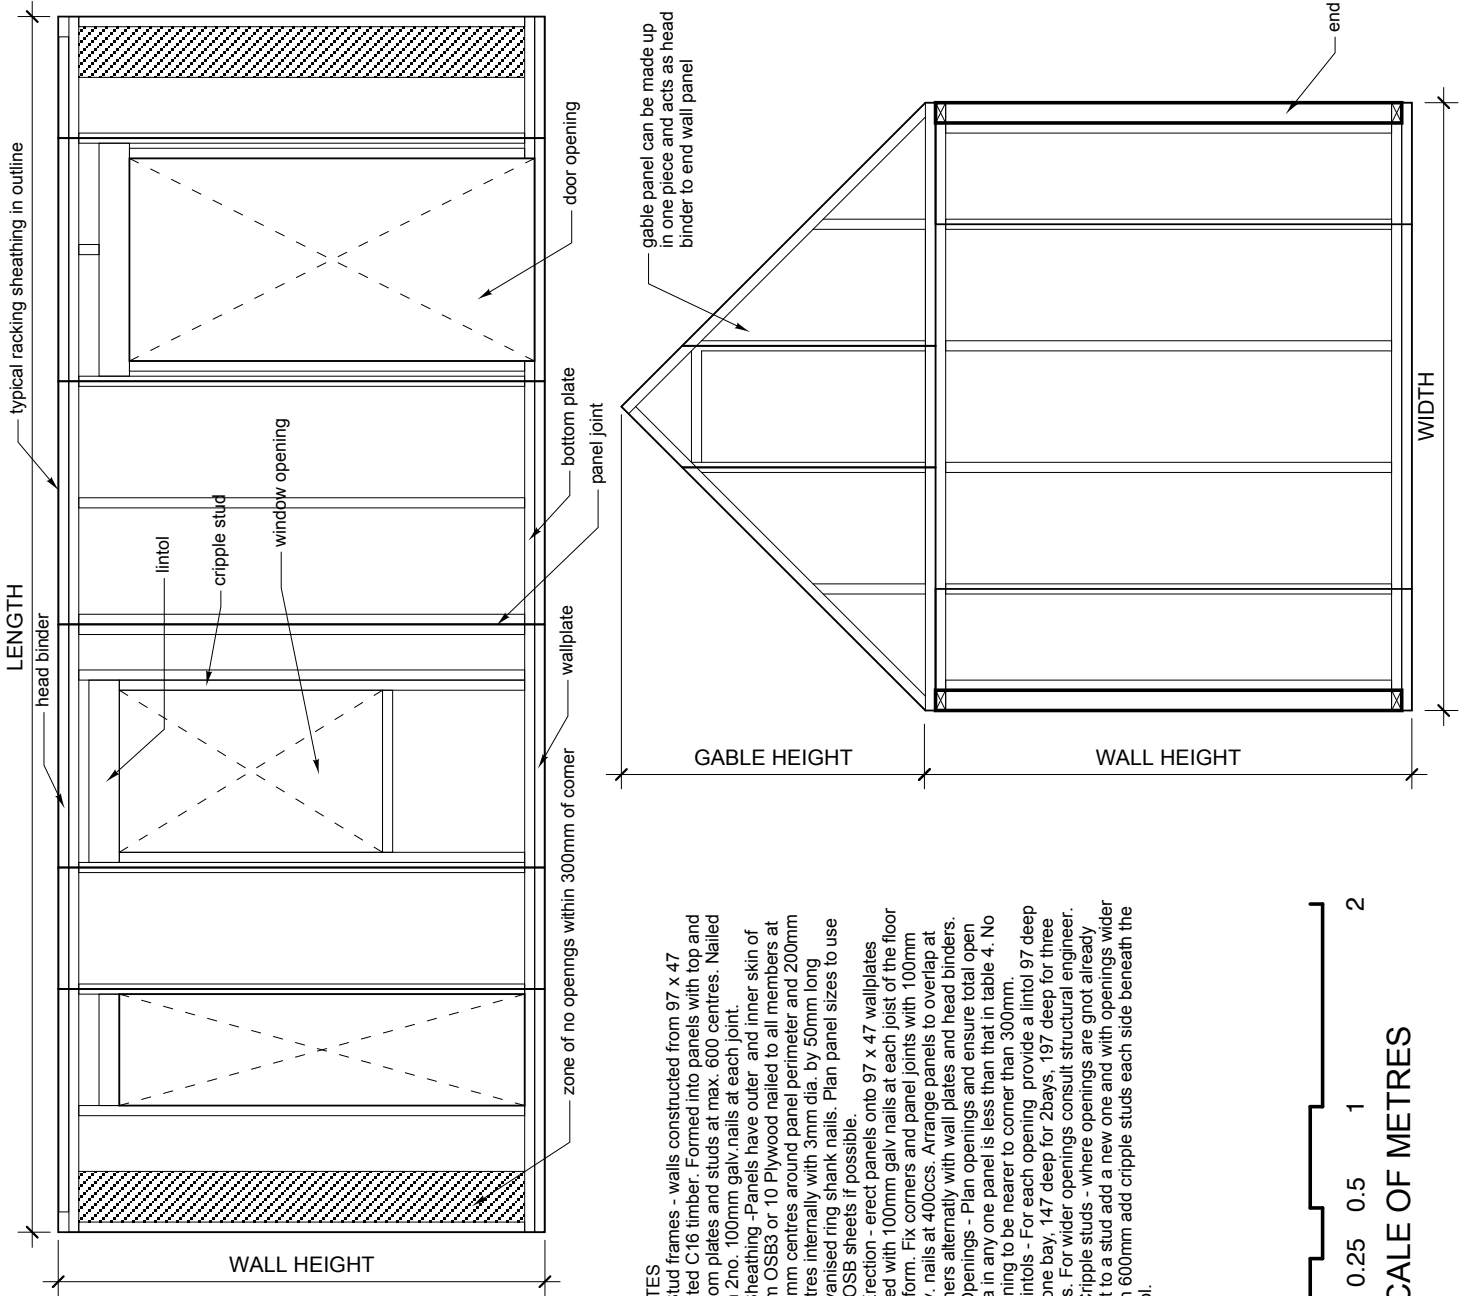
WALL PANELS Stud Frame - Appendix 2
